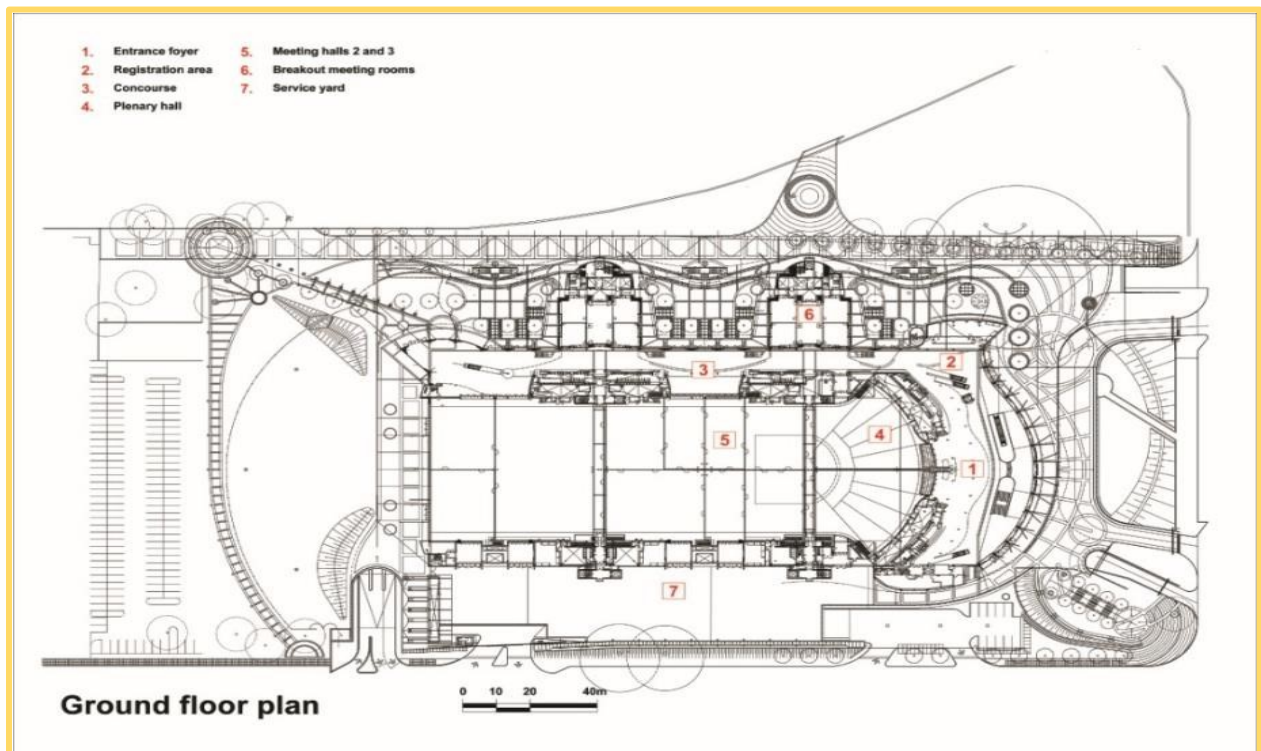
Ground Floor Plan of the DICC, Source: (SVA International (Pty) Ltd, 2017)
